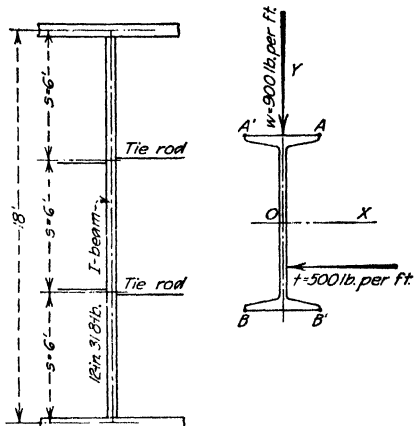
Floor joist subjected to vertical and horizontal moment.
